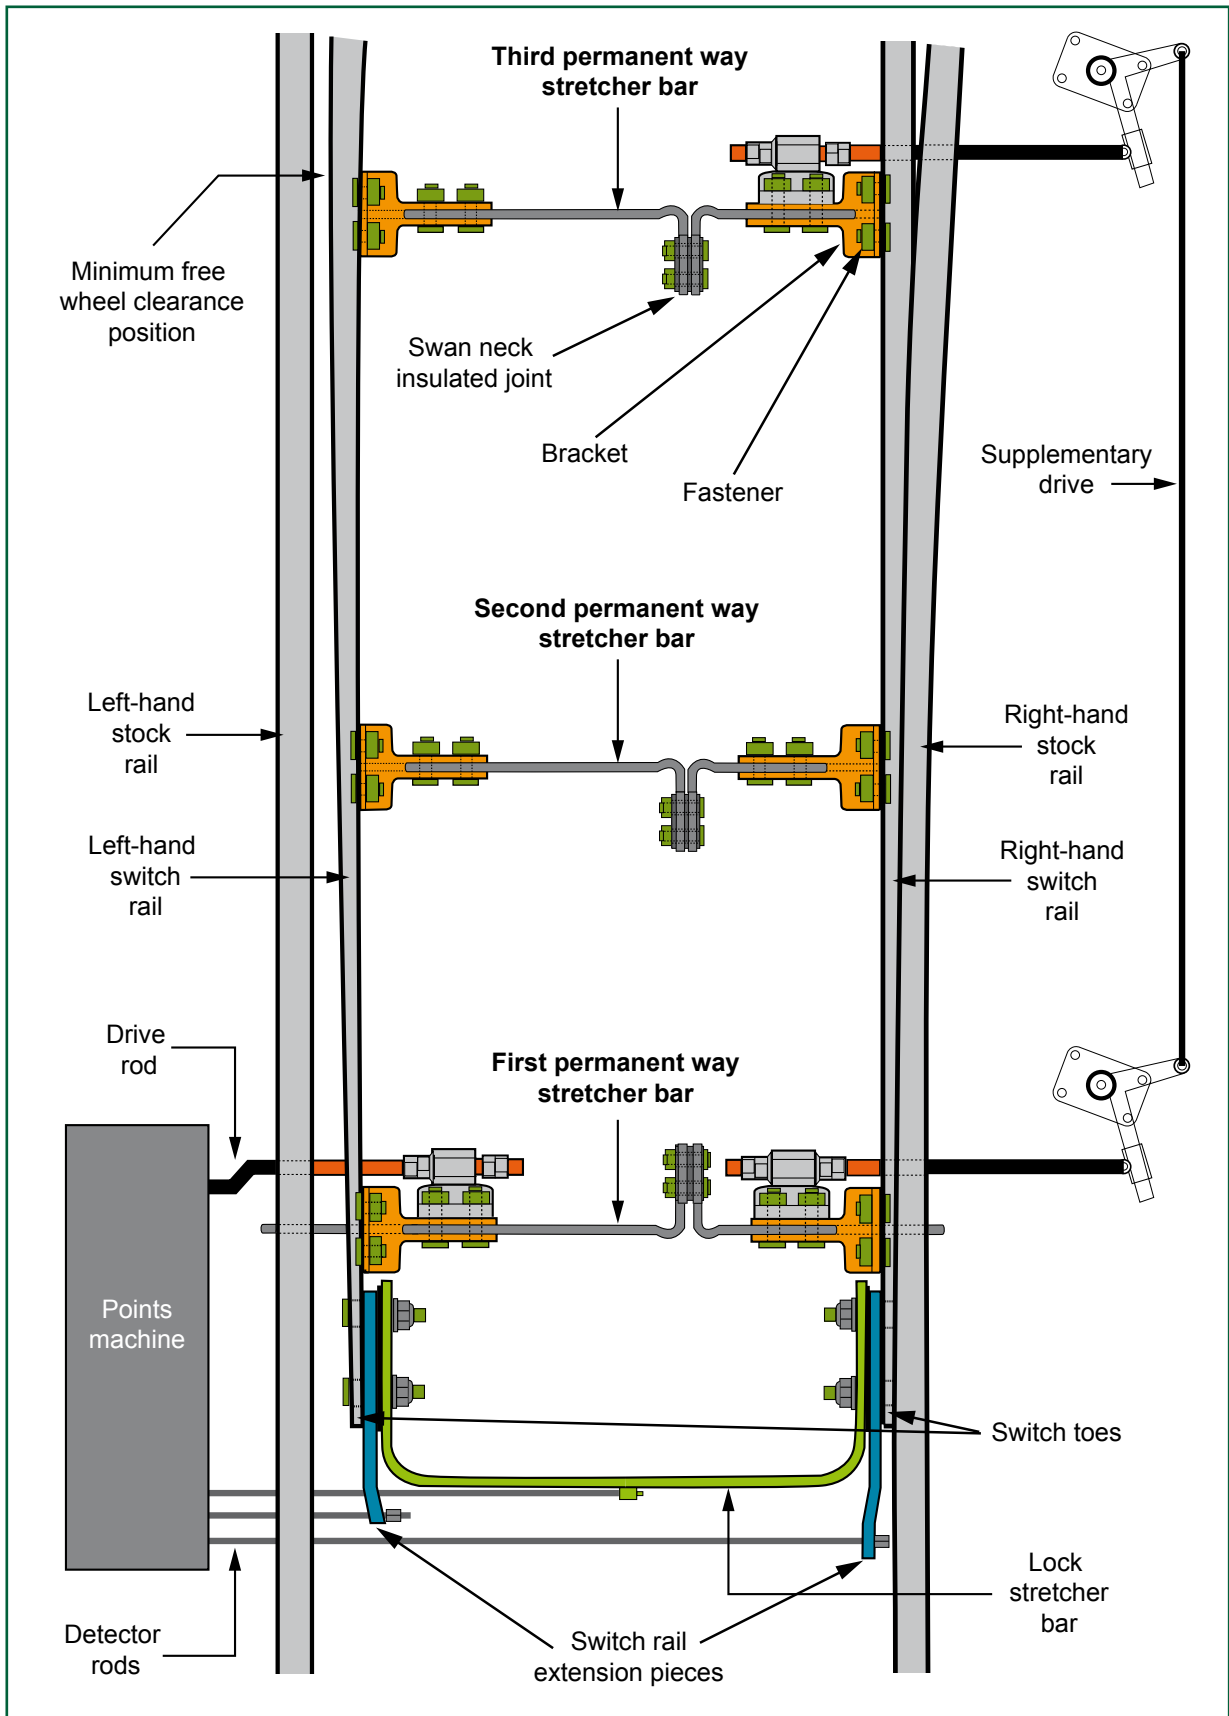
Layout of points showing switch and stock rails and stretcher bars
